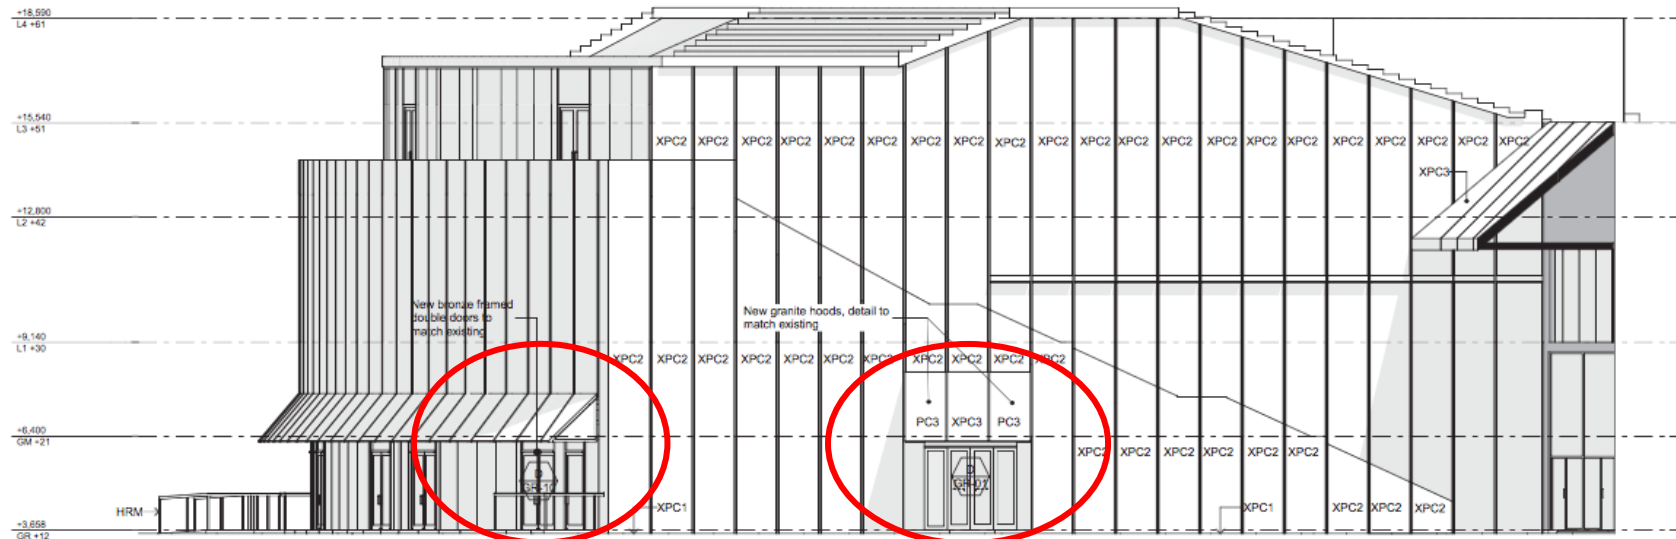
Proposed western elevation with new bronze framed doors and granite hoods to match existing details in RED (Source: TZG)
